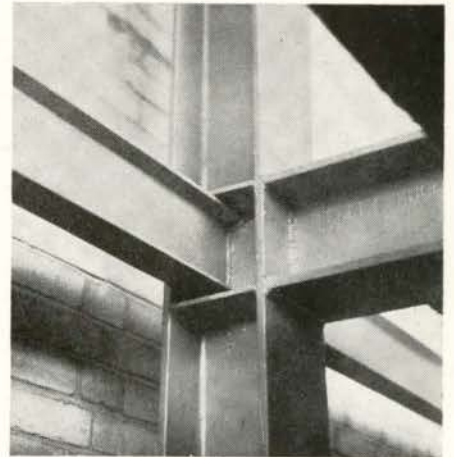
Example of the type of welded detail achieved by the plastic design method. The main frame in a film-storage building of five storeys, one of the few multi-storey buildings yet designed by this method. Consulting engineers: R. T. James and Partners.
